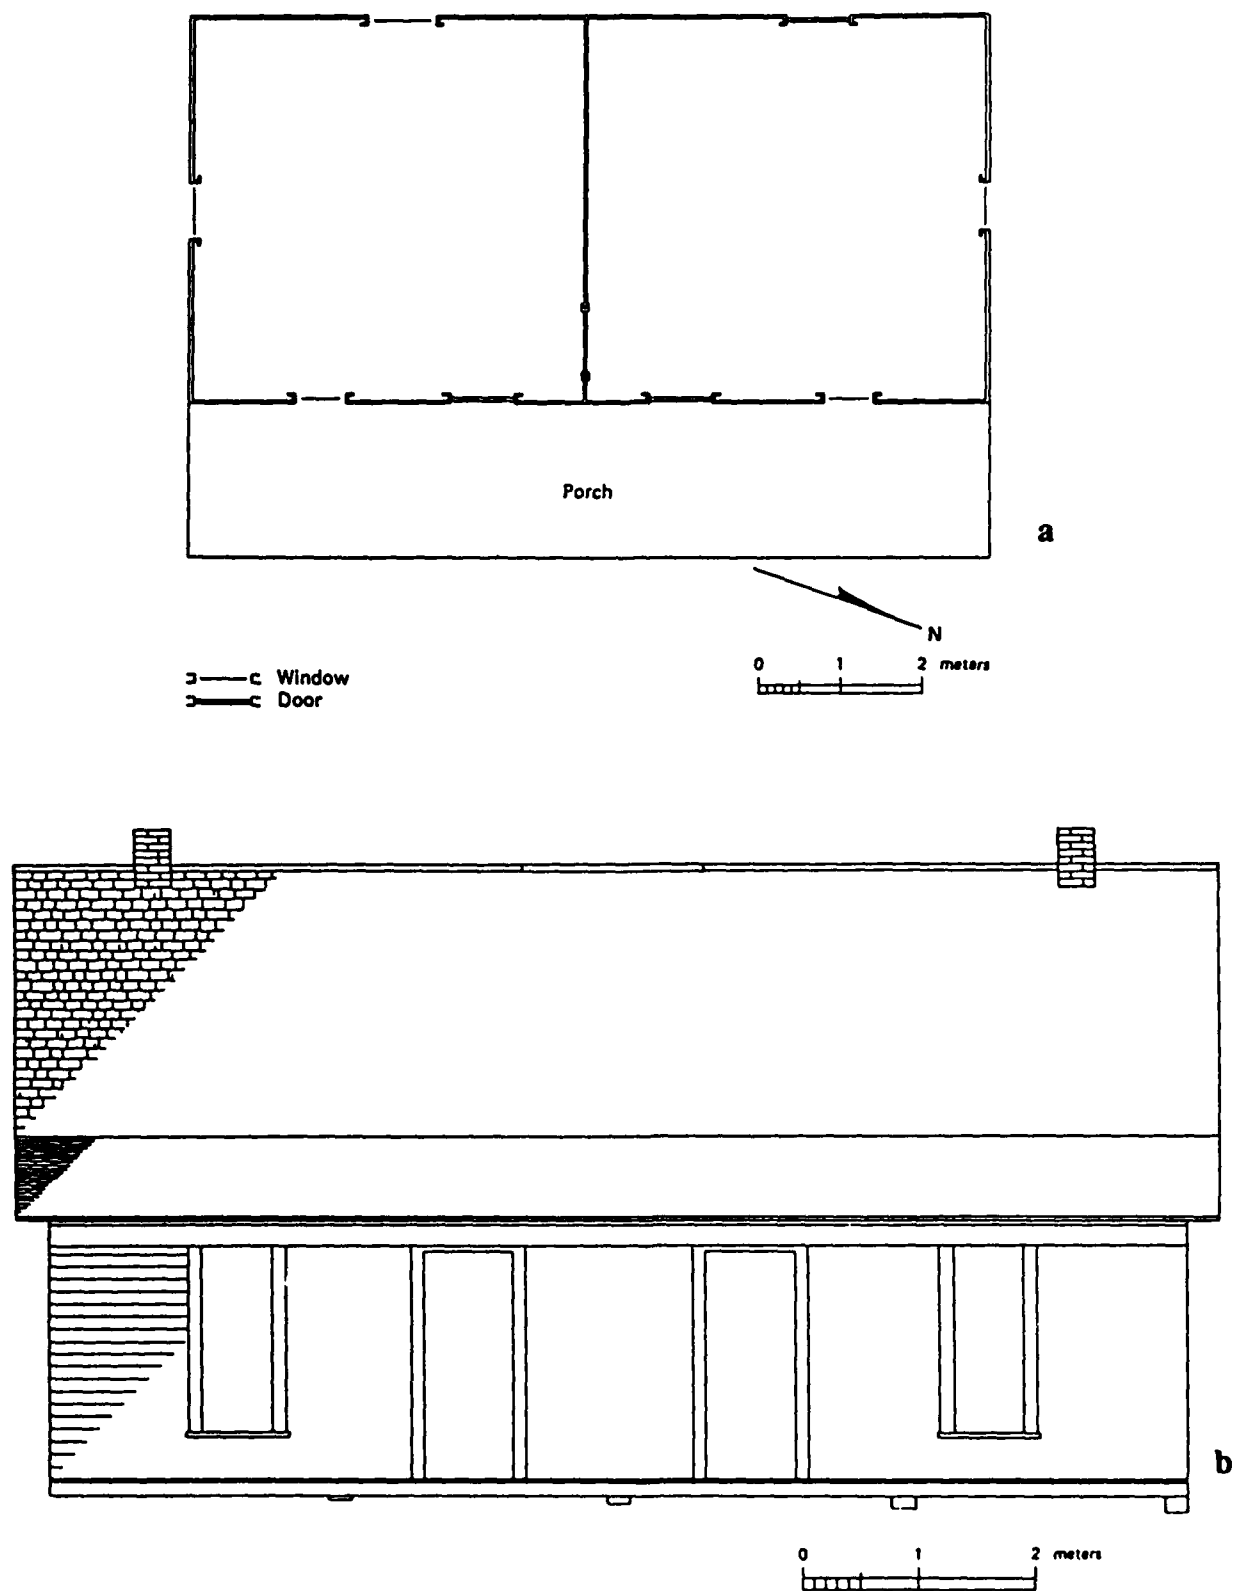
Floor plan (a) and south elevation (b) of the house at site 41DL196 (from Ferring and Reese 1982:Figures 11-59, 11-60).
